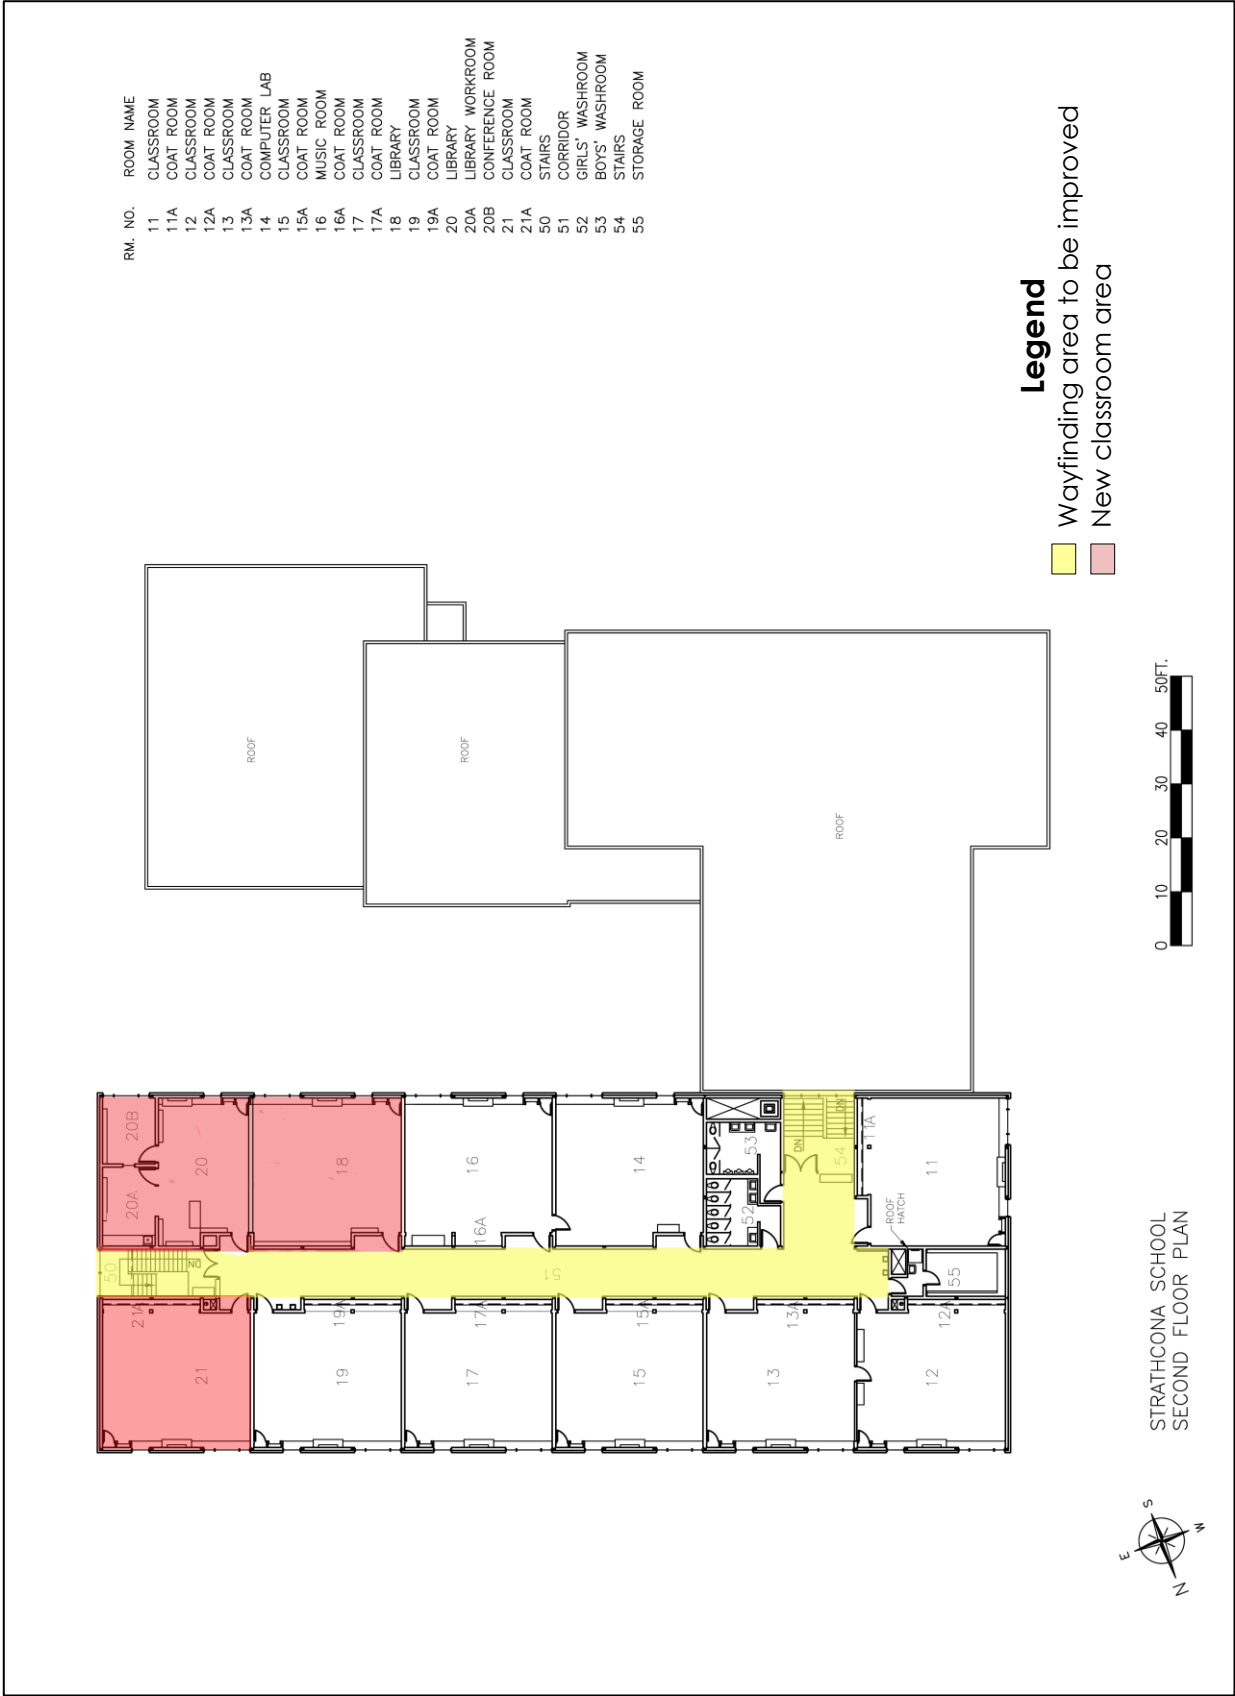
Areas on second floor to be designed for improved wayfinding and for new classrooms.
